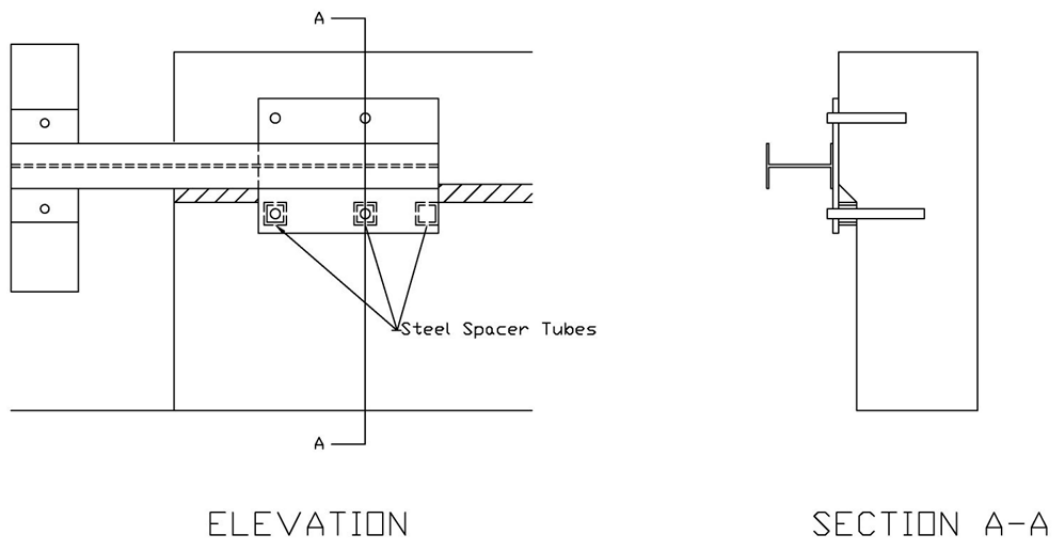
Blunt-End Parapet Retrofit – Steel Spacer Tubes
